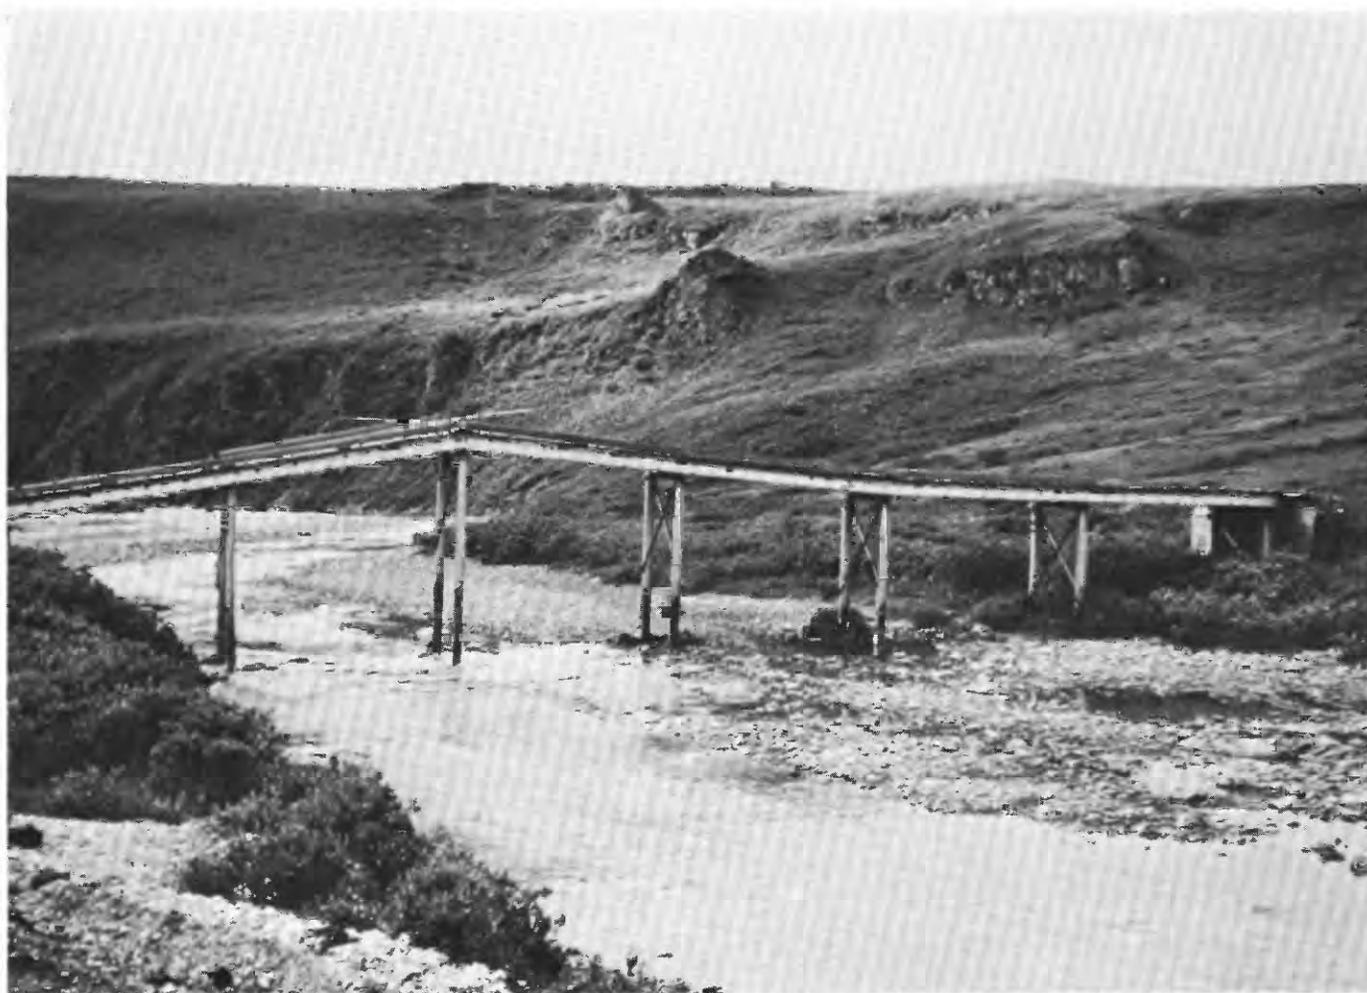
Frost-heaved steel-pile bridge spanning North Fork at about mile 120 on the Kougarok Highway, Seward Peninsula.
